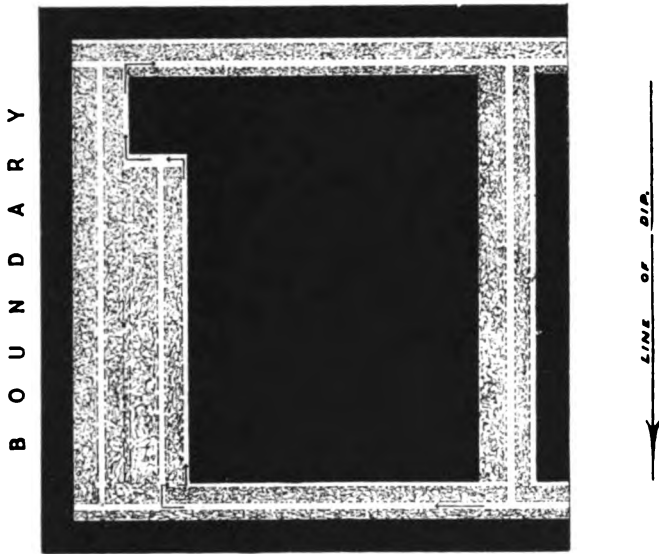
CLIFTON HALL COLLIERY, NEAR MANCHESTER. PLAN SHOWING METHOD OF WORKING THE FIVE-QUARTERS COAL SEAM.
